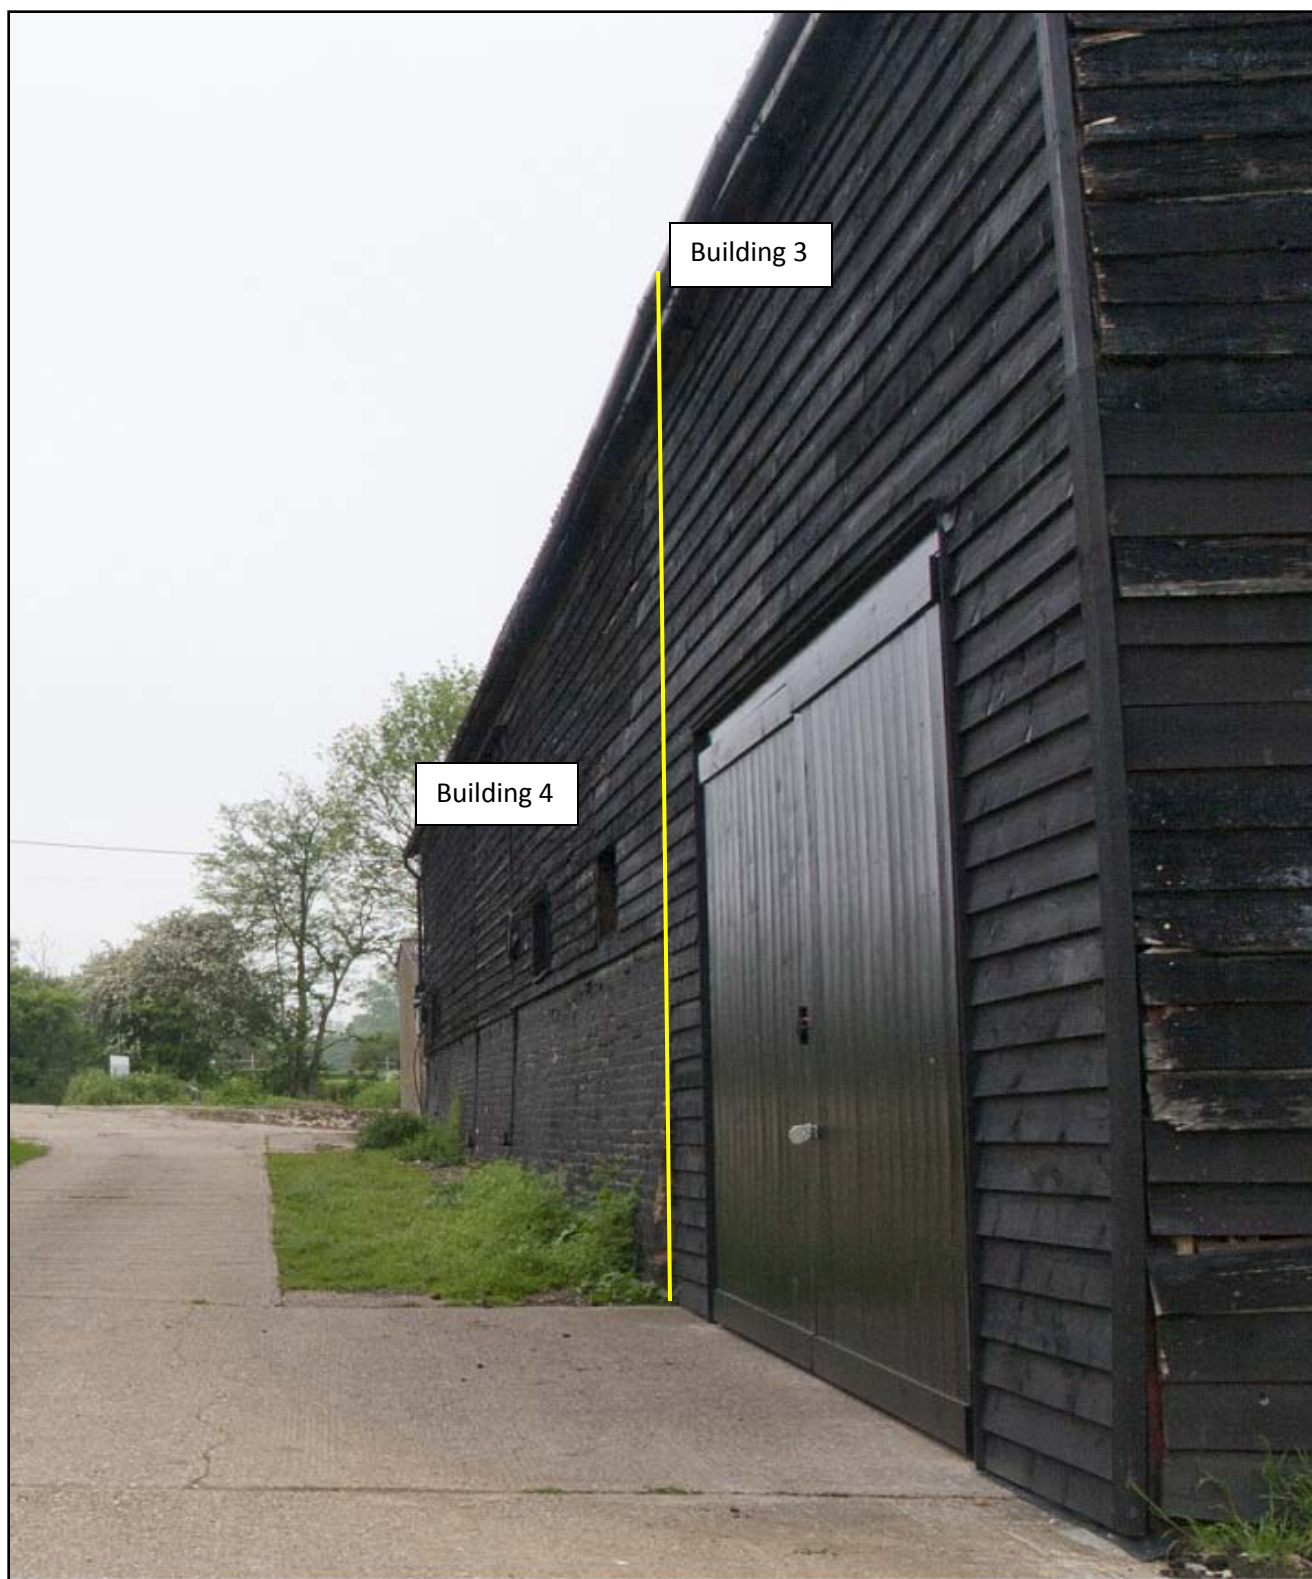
The south elevation of Buildings 3 and 4, viewed from the south-east
